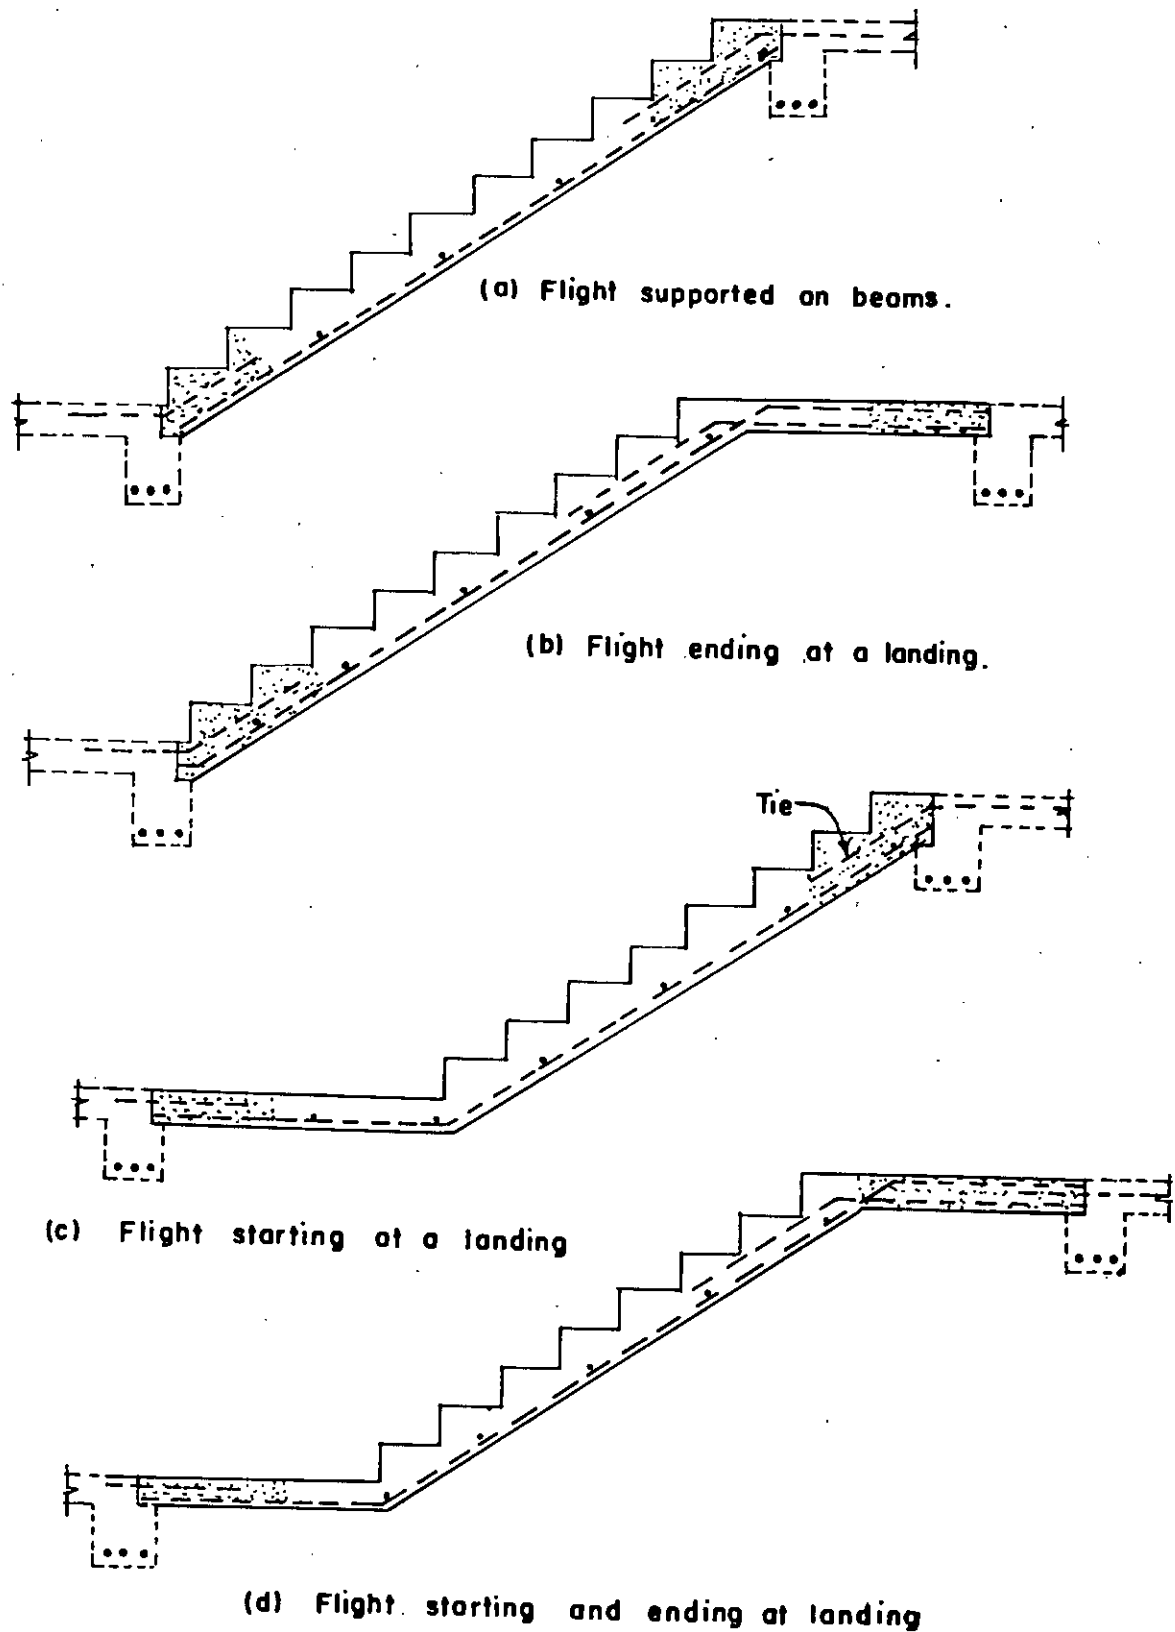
Types of concrete stairs and support arrangement. (Ref. 16)
